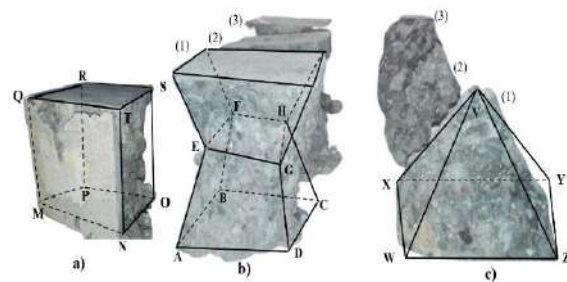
a) fracture surface of a rejected case in the GS30 samples, b) fracture surfaces in the GS20 samples, and c) fracture surfaces in the GS10 samples.
